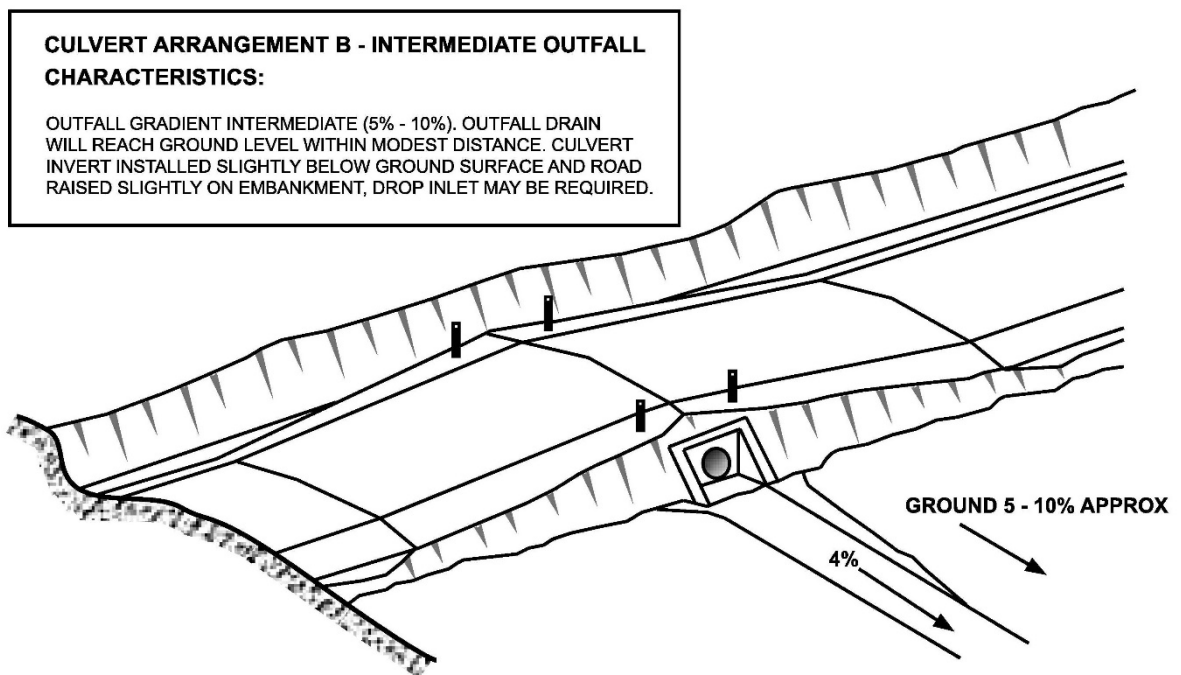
Culvert Arrangement B - intermediate outfall
